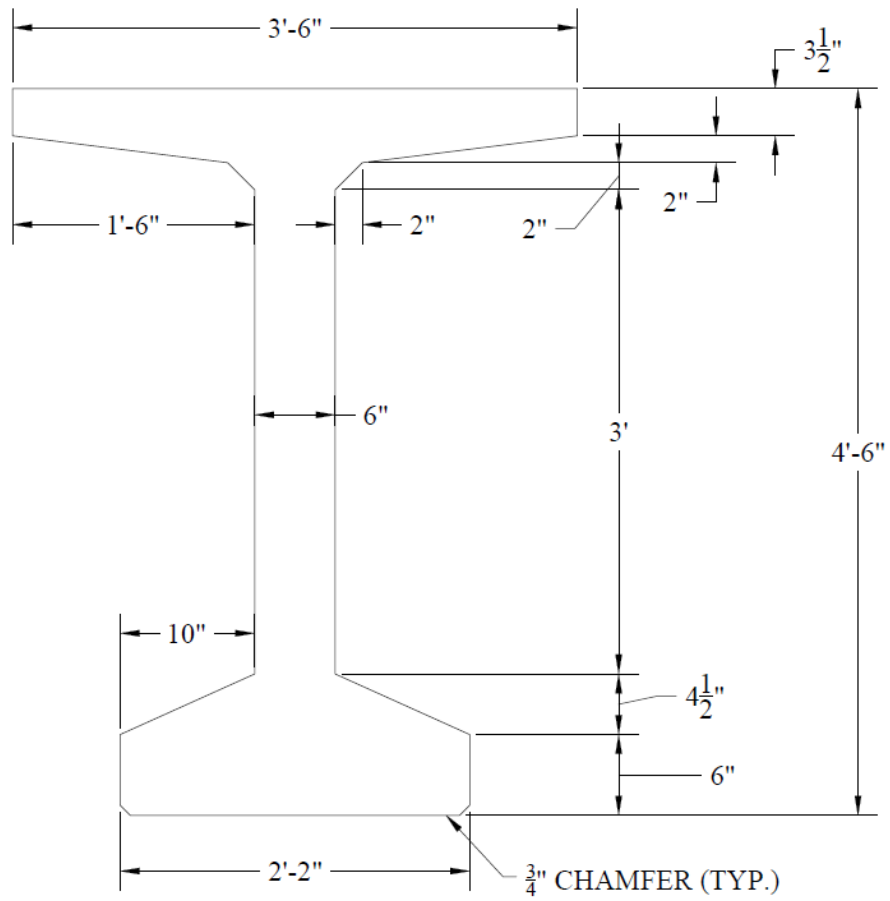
Type BT-54 Prestressed Girder (CLB-1)
